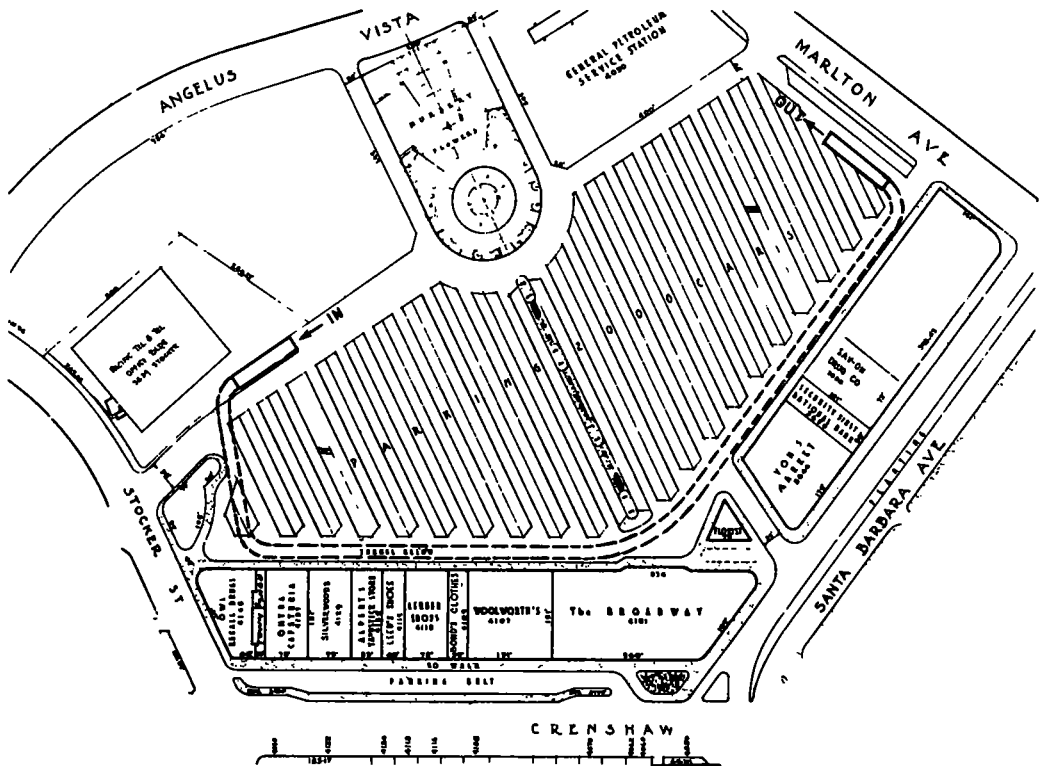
The Broadway-Crenshaw shopping center, Los Angeles, showing, in diagrammatic form, the truck tunnel serving the underground loading and unloading docks. Not only is an essential service rendered by the underground facilities, but a physical and psychological hazard for shopper-parkers is also removed. ---Adapted from drawing by Albert B. Cardner, Architect. Courtesy Frank C. Balfour, California Division of Highways.
